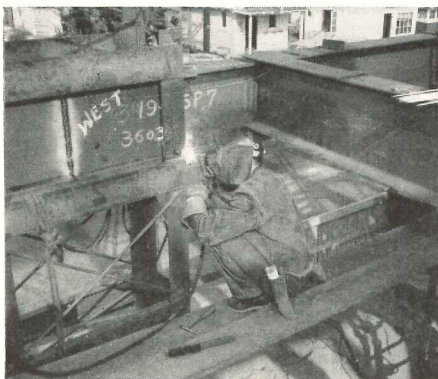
Arc welding girder-to-column. This is the only weld where a scaffold was used.
